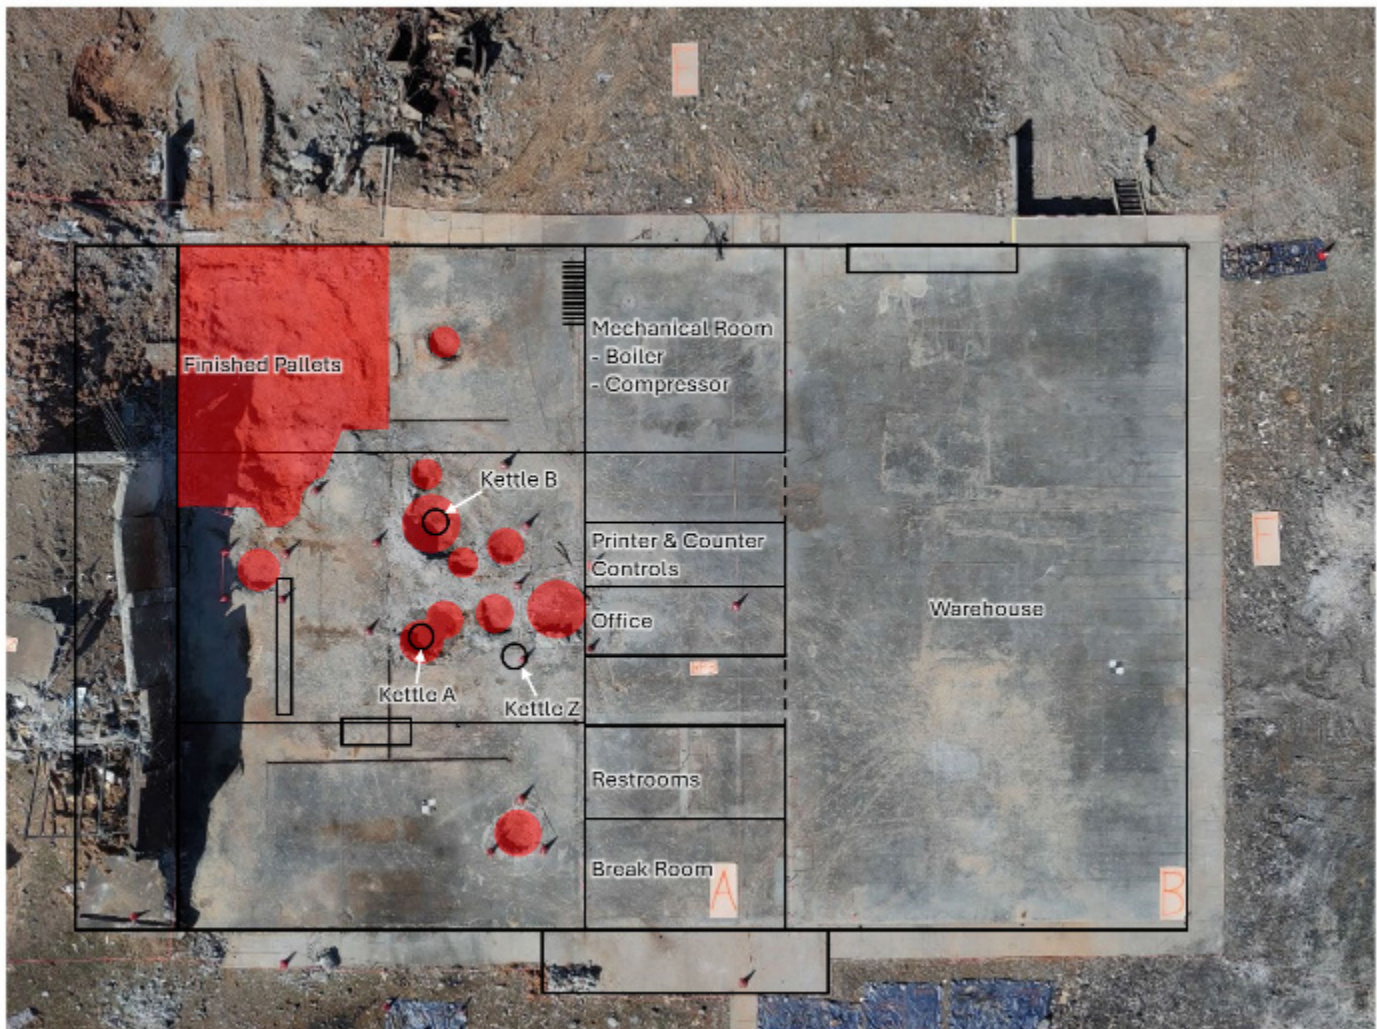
Building 602's foundation after the incident with walls and equipment overlaid. Craters and foundation damage are indicated in red. (Credit: ATF via WKRN [17] with annotations by CSB)
